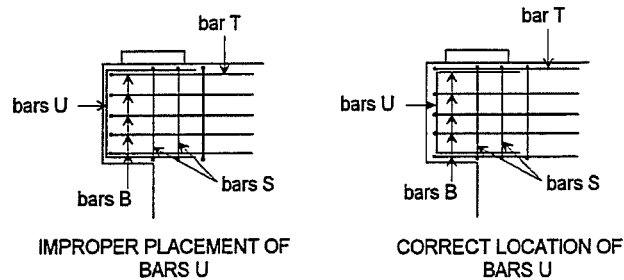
Improper Placement of Bars U in Specimens A1 and A2
